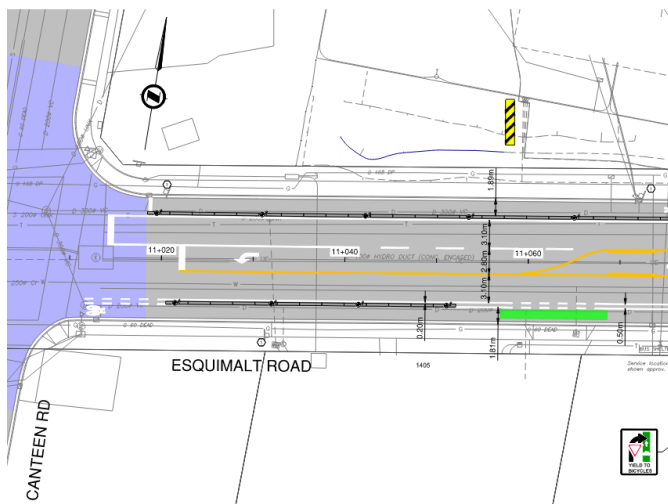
East leg of Esquimalt Road & Canteen Road Intersection – Proposed (ISL 2026)
